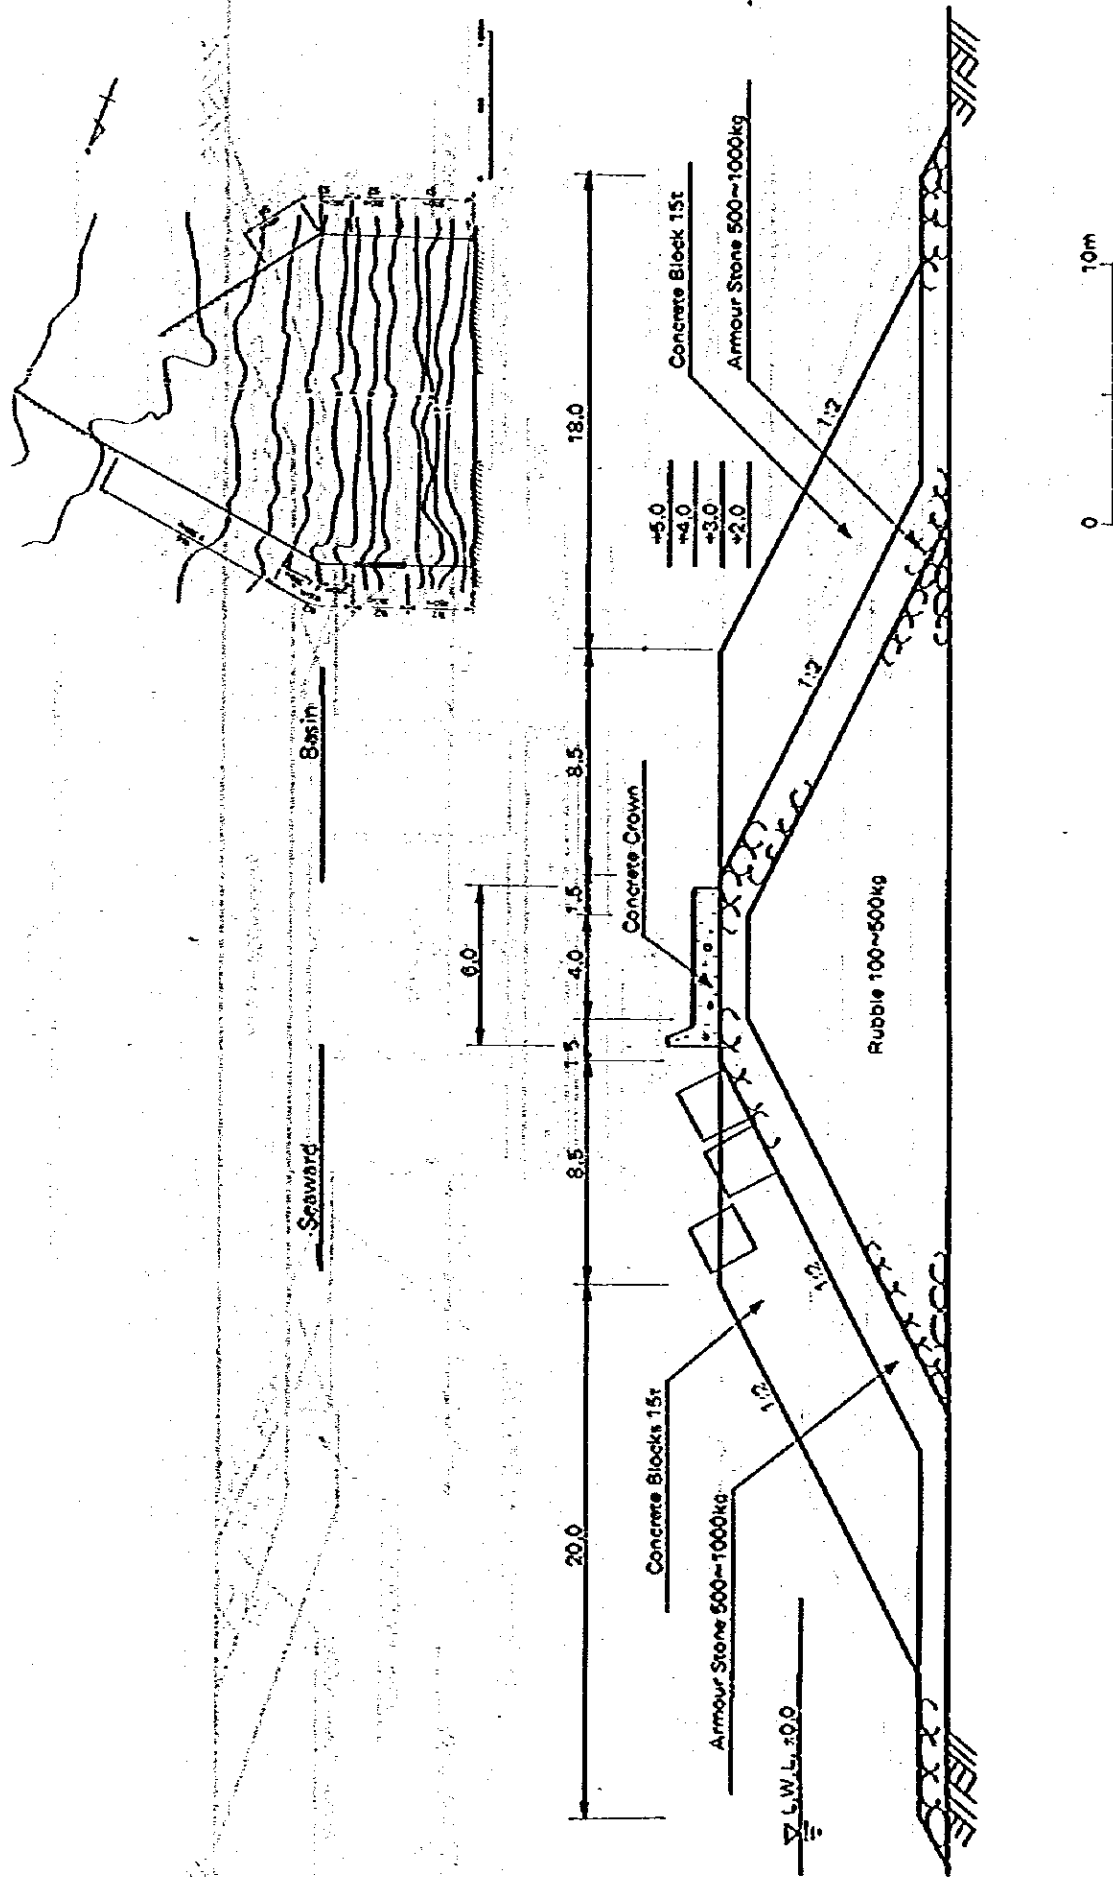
(3) Standard Cross-section of Breakwater (N2 Section)
